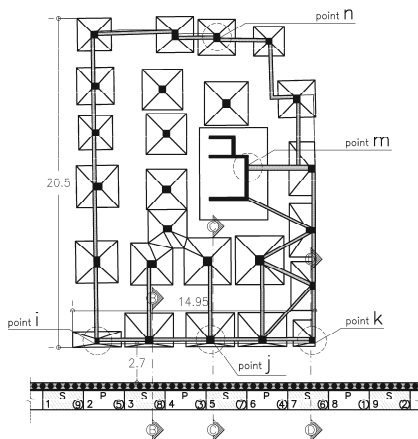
Individual footings of a 6-story building together with the diaphragm wall and the micropiles
